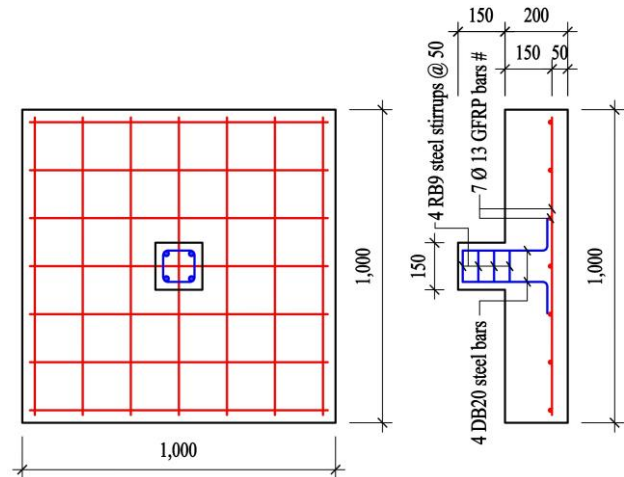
Dimensions and detail of specimens F1, and F2 (Unit: mm)
